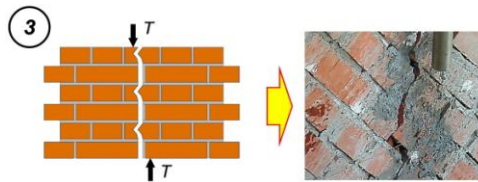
Clay brick masonry destruction pattern under shear loads (acting perpendicular to horizontal masonry joint)
